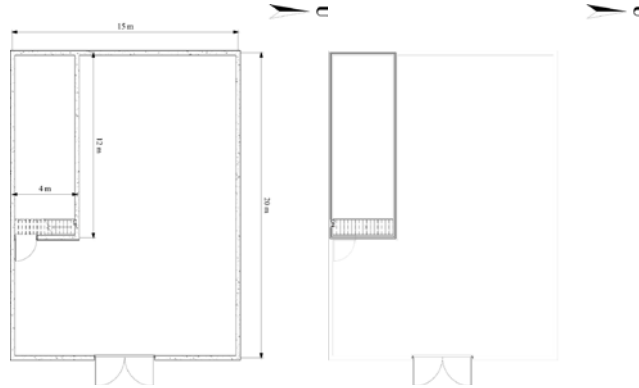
GATE Workshop Location Plan 1st and 2nd floor
